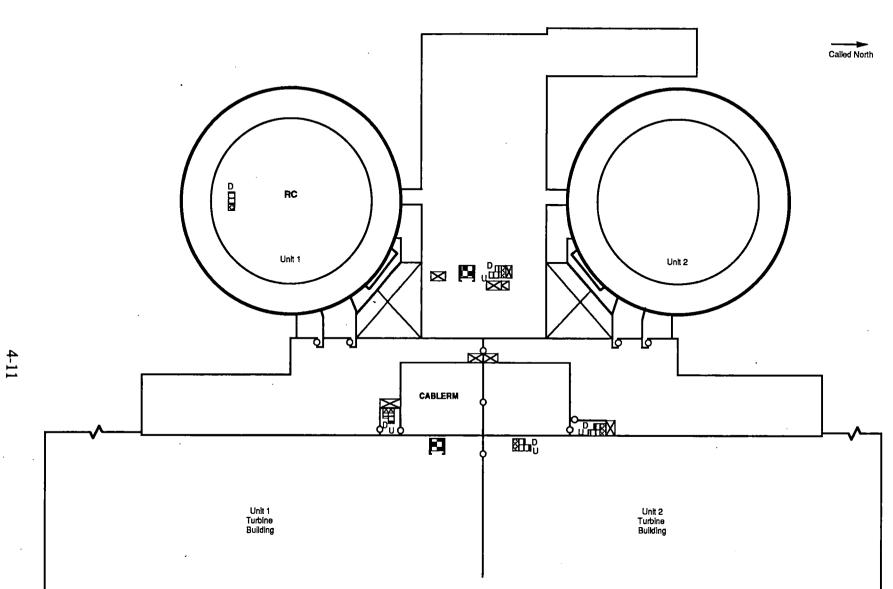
Zion 1 and 2 General Arrangement, Elevation 630'
